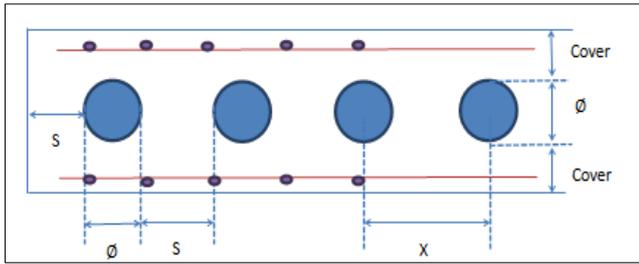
Typical cross section of bubble deck slab used in current study
